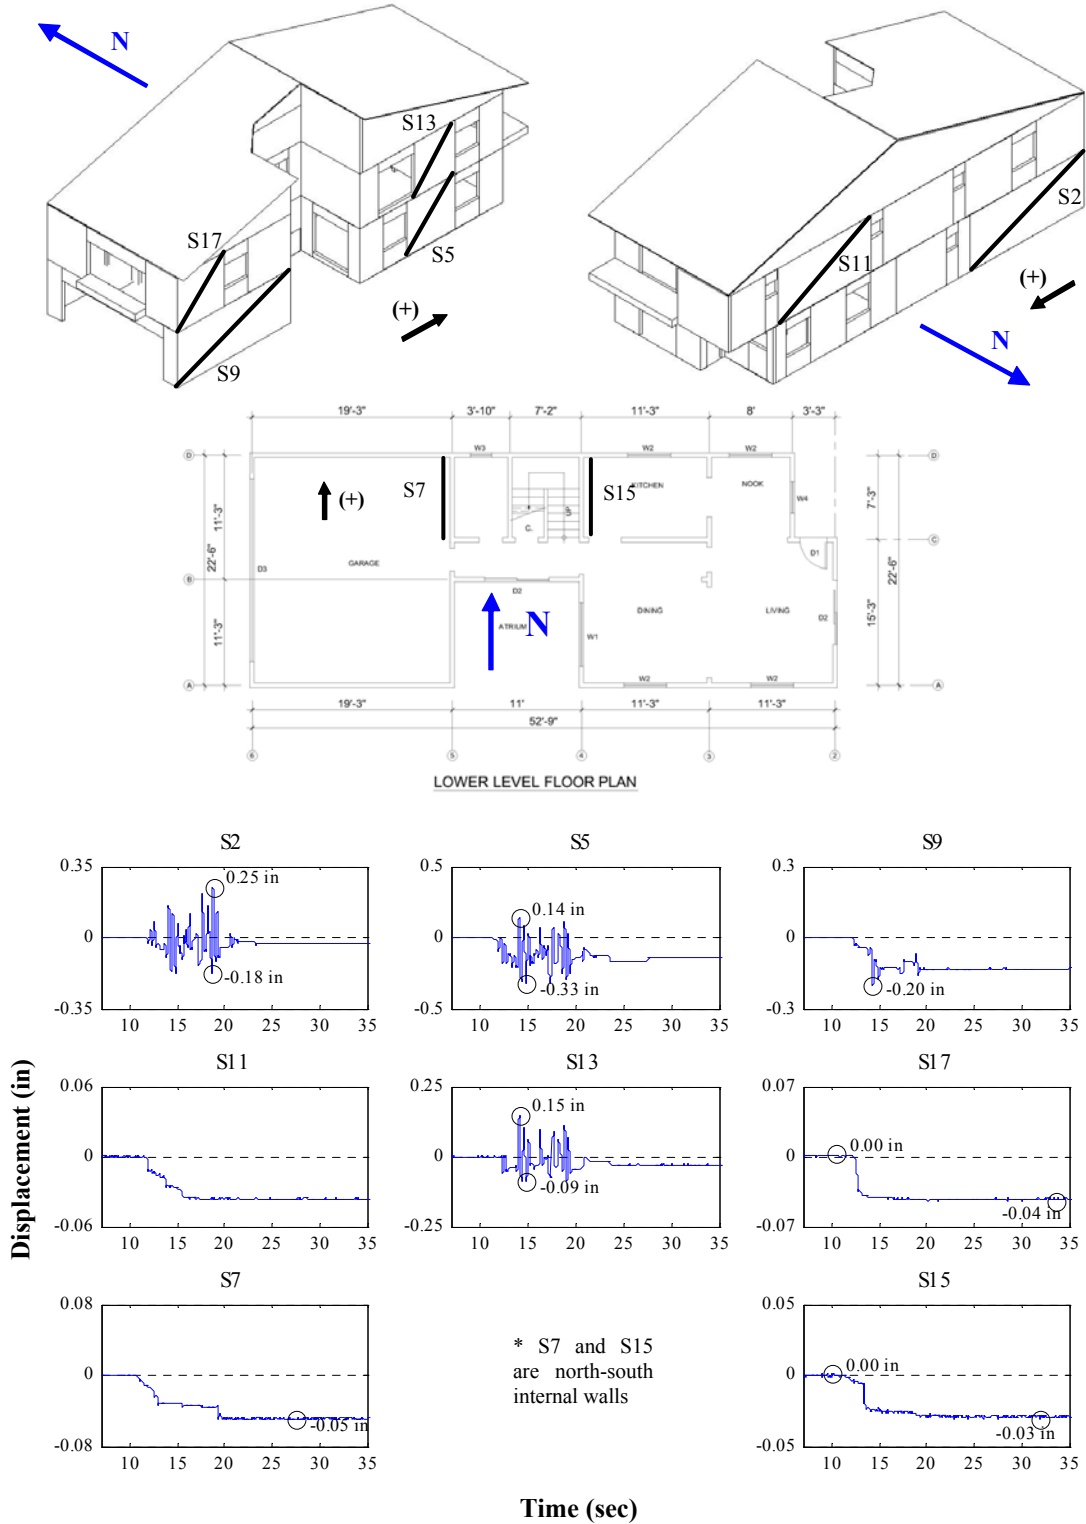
Wall deformations of east-west internal walls for Test NWP2S26
